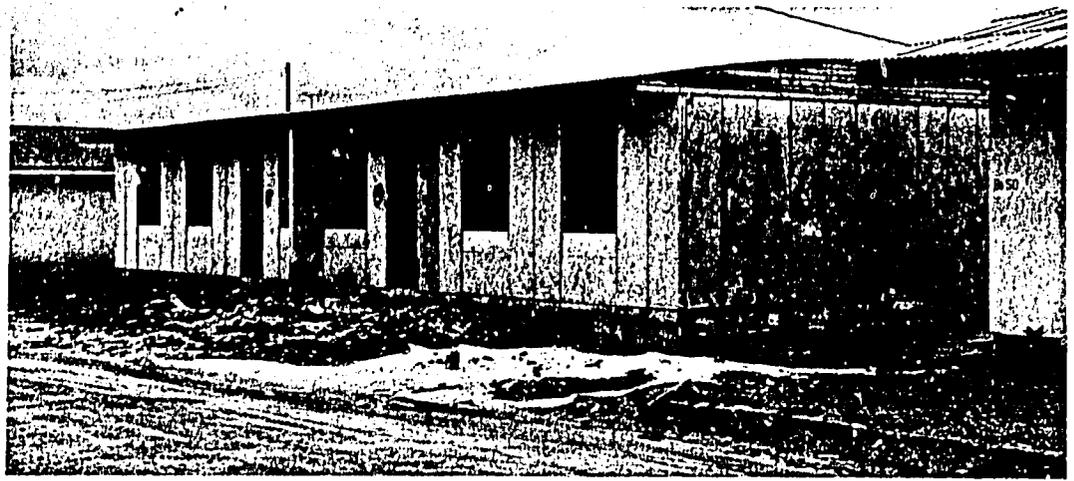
Tolbert Estates. Norwegian panel houses under construction. Imported light weight wall panels are used instead of concrete block and bowed, corrugated aluminum roofing replaces the asbestos roofing used in NHA houses. Otherwise construction is similar.
